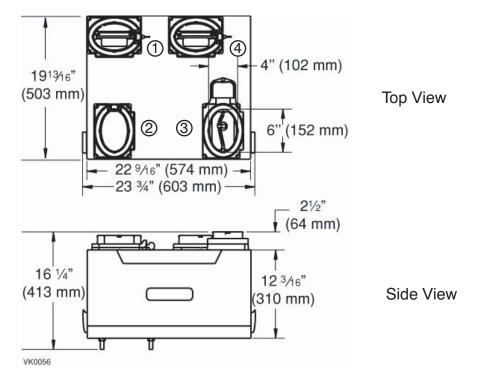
ERVCCSVB and HRVCCSVB Unit Dimensions
